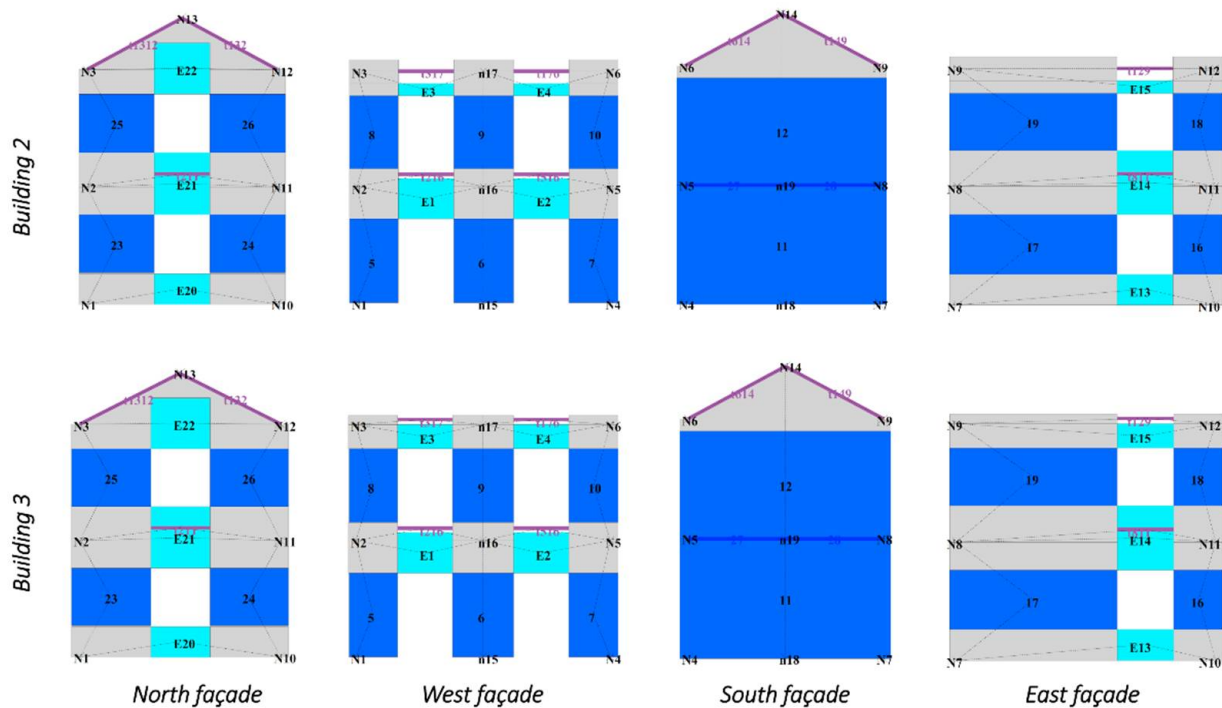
Geometrical discretization of walls in Building 2 and Building 3 models.
